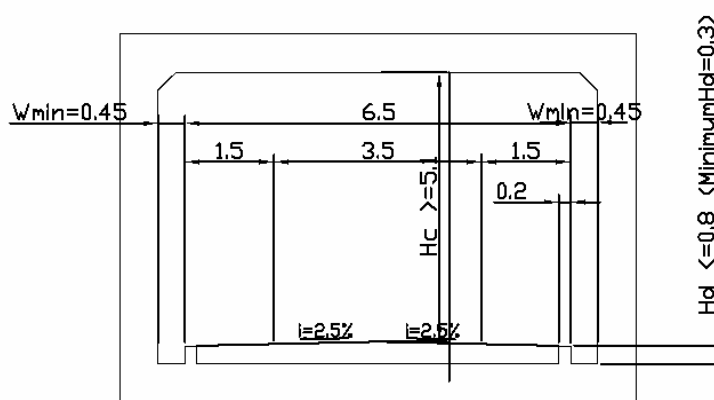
Details of Inner Box Culvert (Class-D Road)
